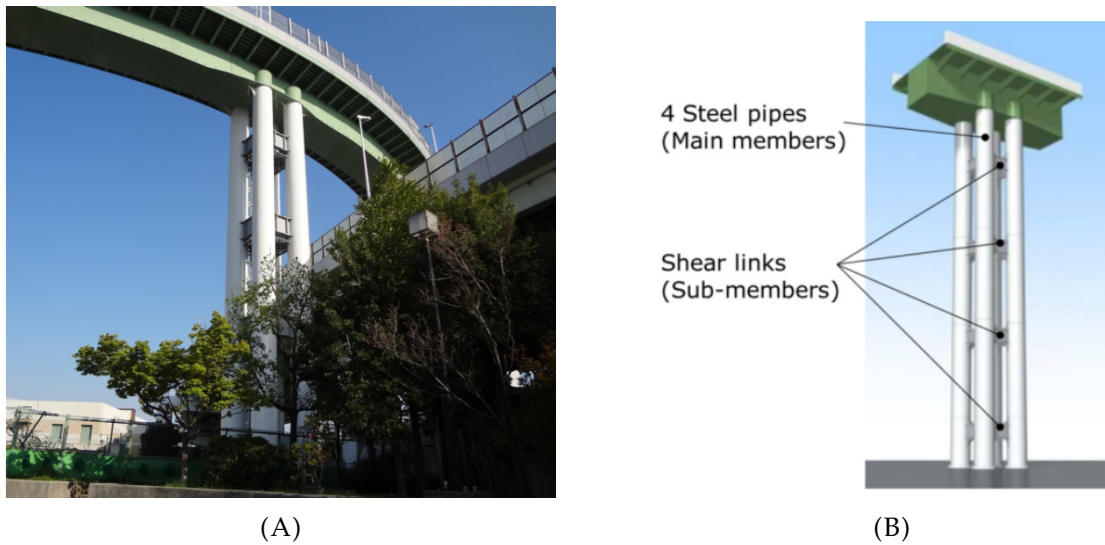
The integrated bridge pier with steel pipe column connected by shear panel damper [37]: (A) the implementation and (B) the concept.
